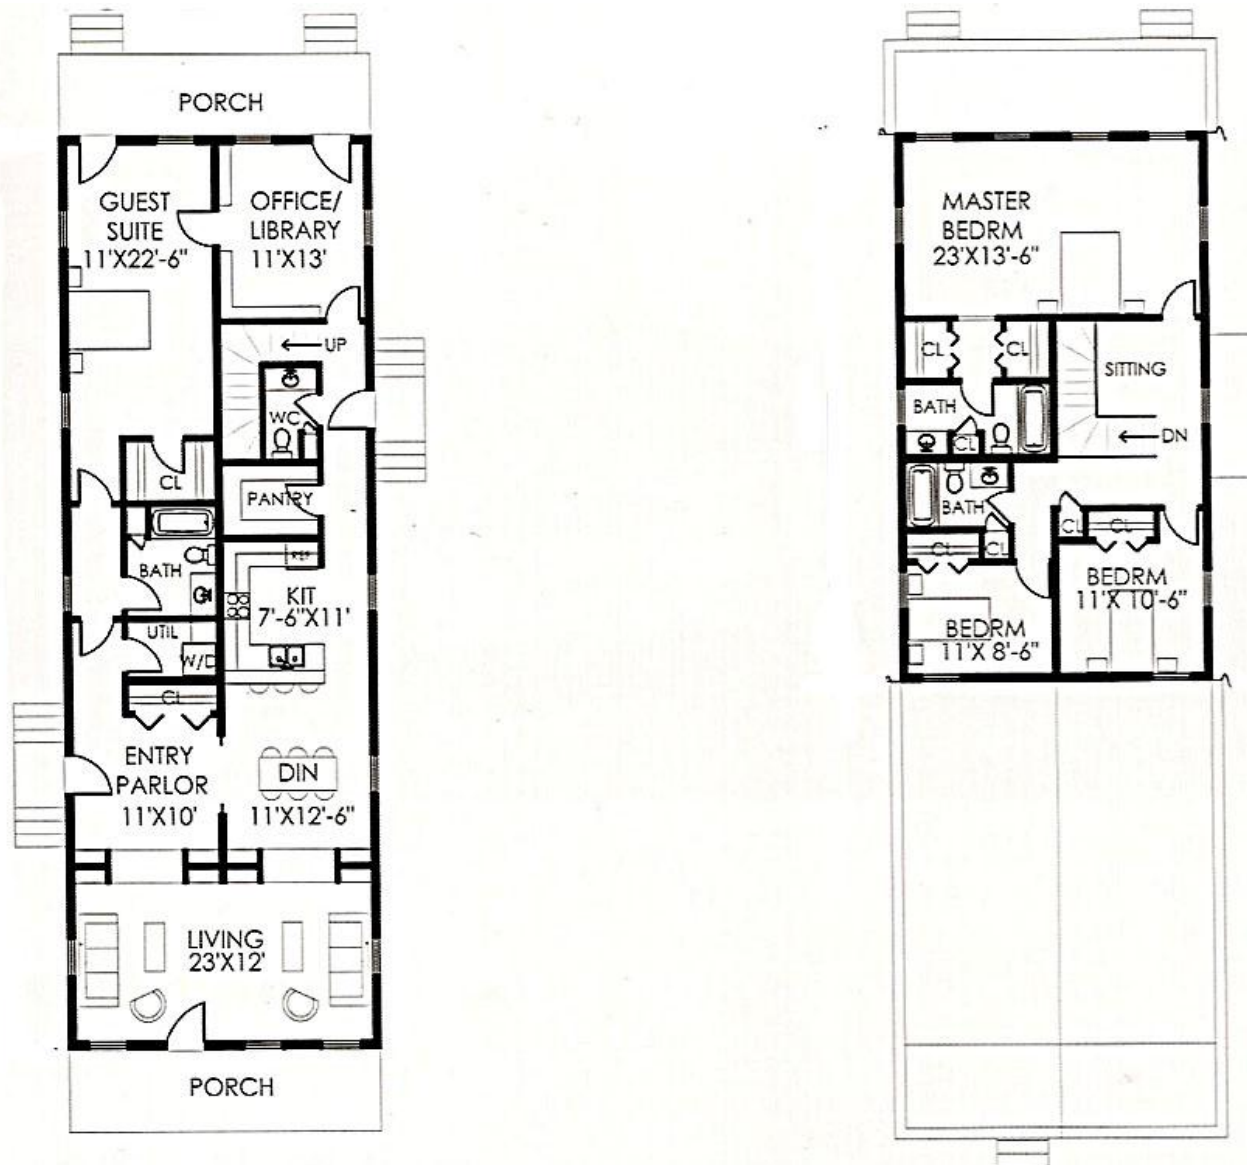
Plan view of a single barrel, four-bay shotgun house with a camelback addition.
